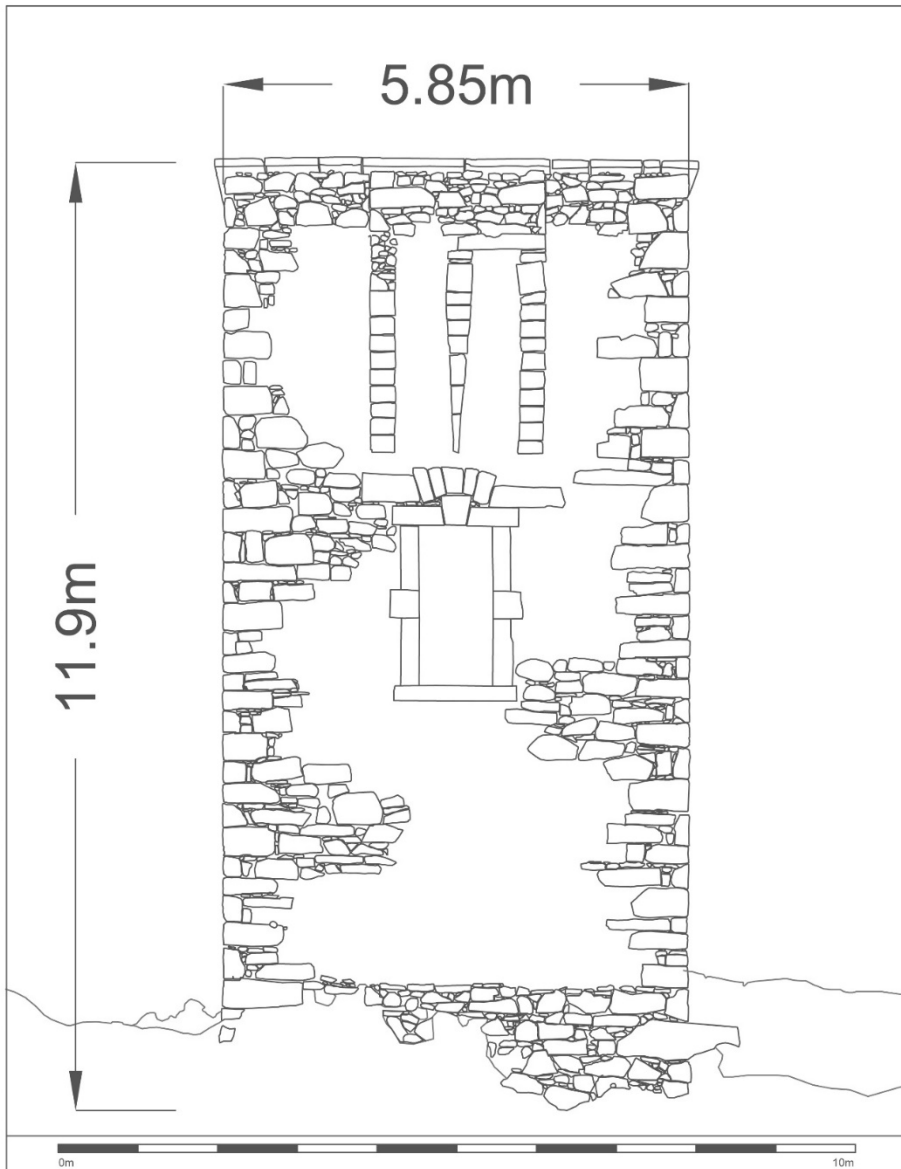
External elevation of the south-west wall of the signal tower at Golam Head Signal Station.
